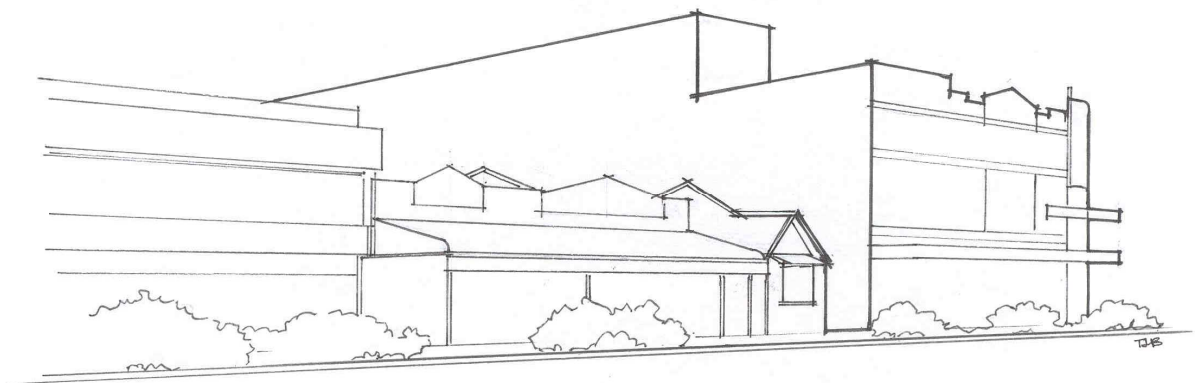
Large blank facades above the awning line are undesirable. Parapet windows should be installed to break-up the facade.
